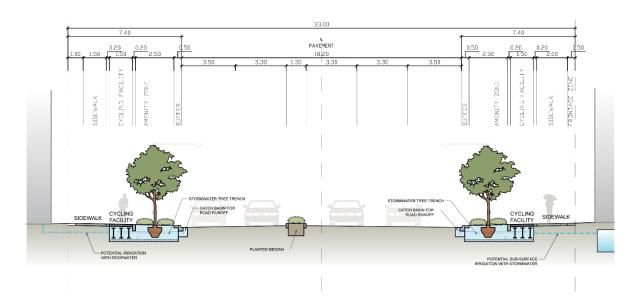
Minor Arterial Green Street Design with Tree Trenches
